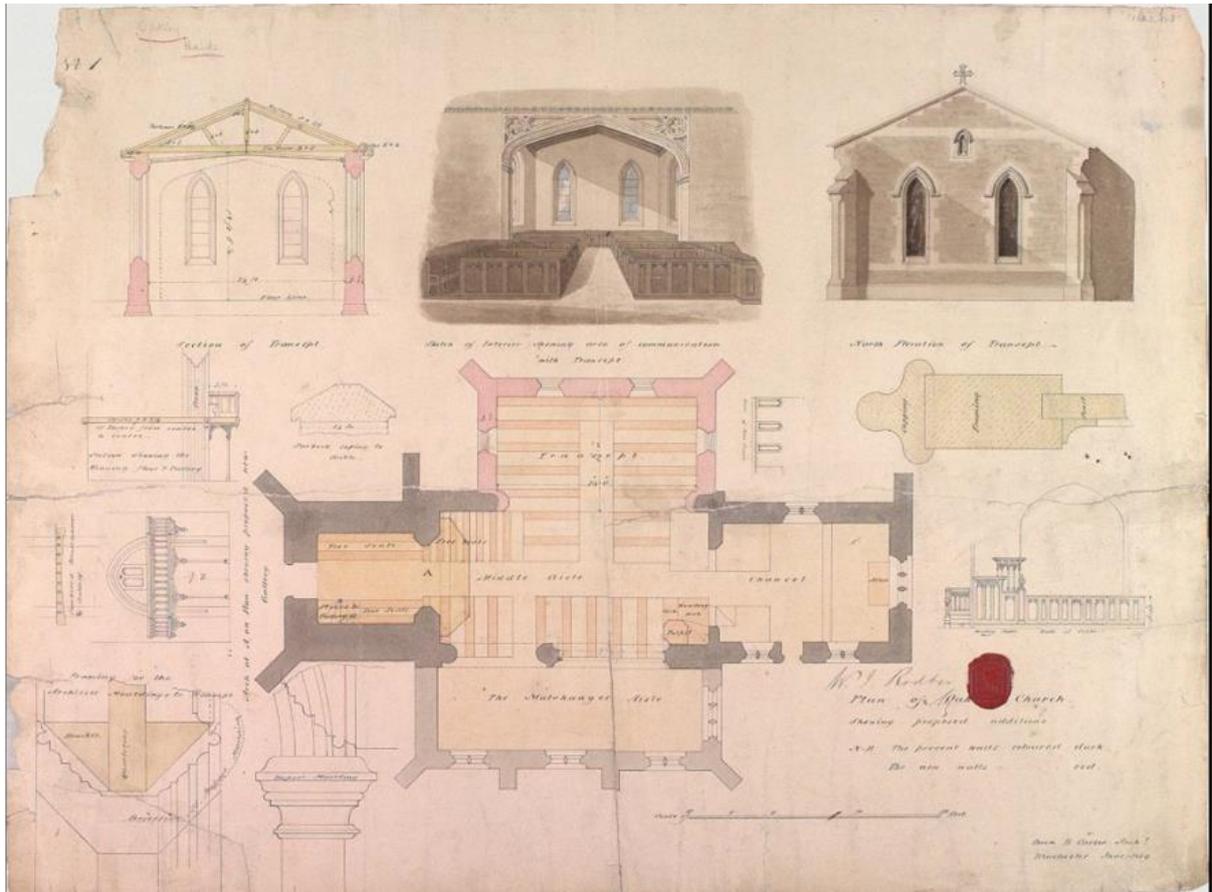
1840s Plan¹ showing the addition of transept with a pitched roof to the northern footprint of the church building (North is to the top of the page).
